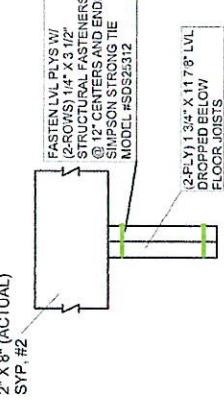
(DETAIL B-B) LIVING ROOM CEILING HEADER REPAIR
